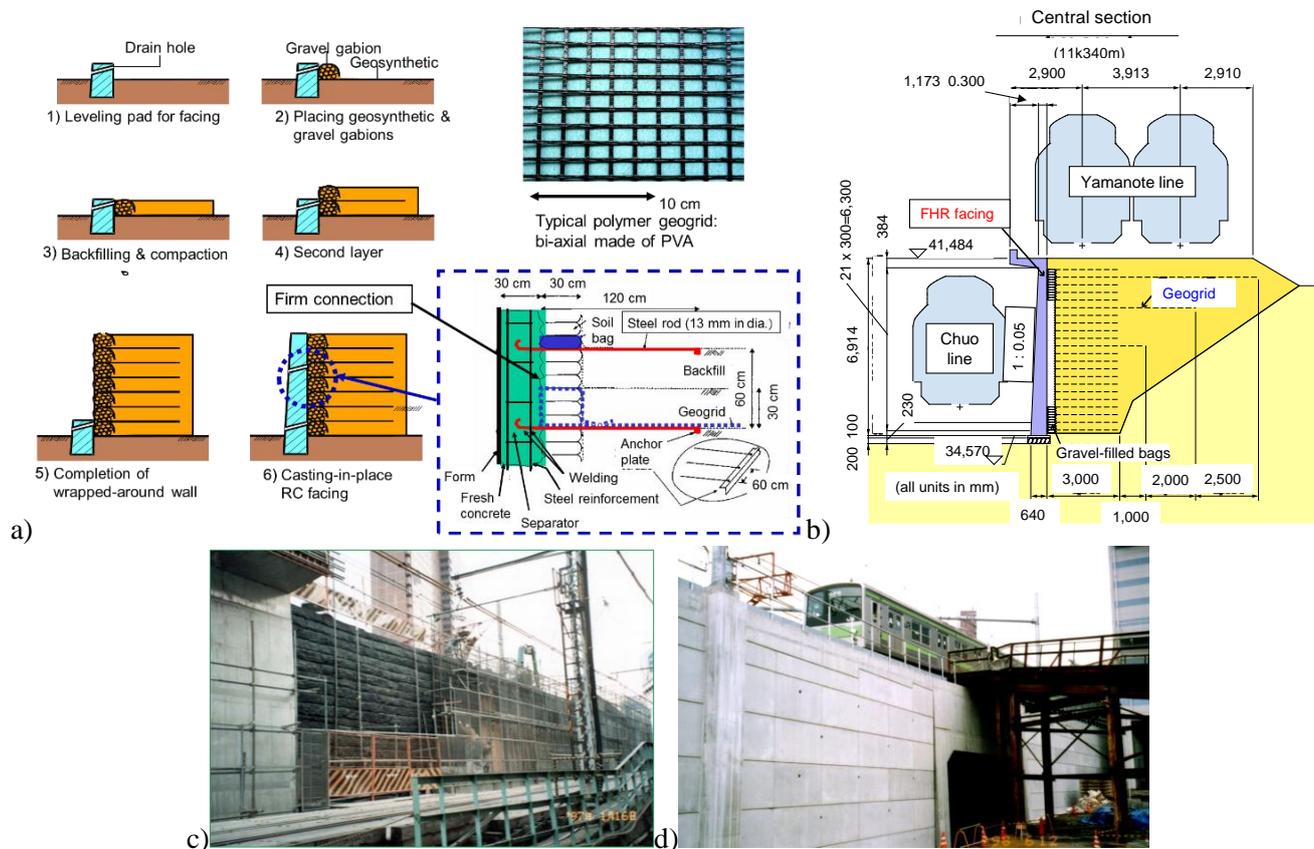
a) Staged-construction of GRS RW with FHR facing; and a typical wall near Shinjuku Station, Tokyo, constructed during 1995 – 2000: b) cross-section; and c) & d) views during construction and completed.
